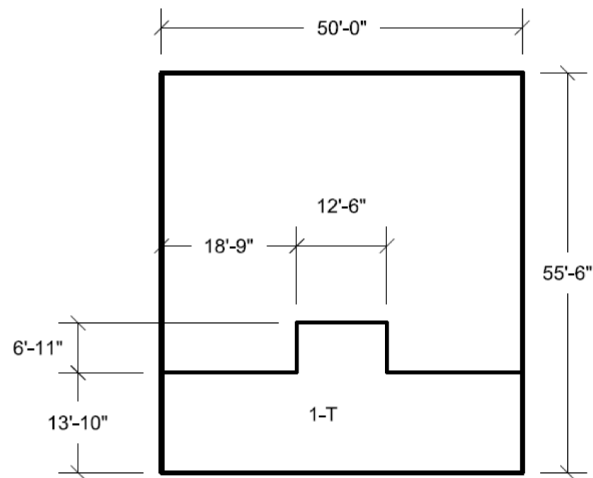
H.6-122A Cooling Tower Internal Wall Looking West
